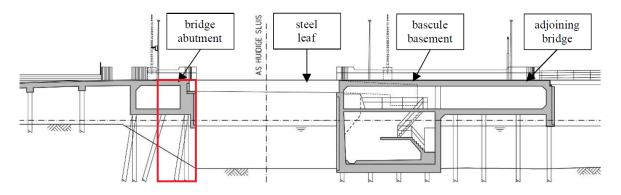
Cross-section of the Beatrix Bridge (viewed from north to south) with the partly demolished embankment on the left and the bascule basement on the right [van Cann et al., 2017]
